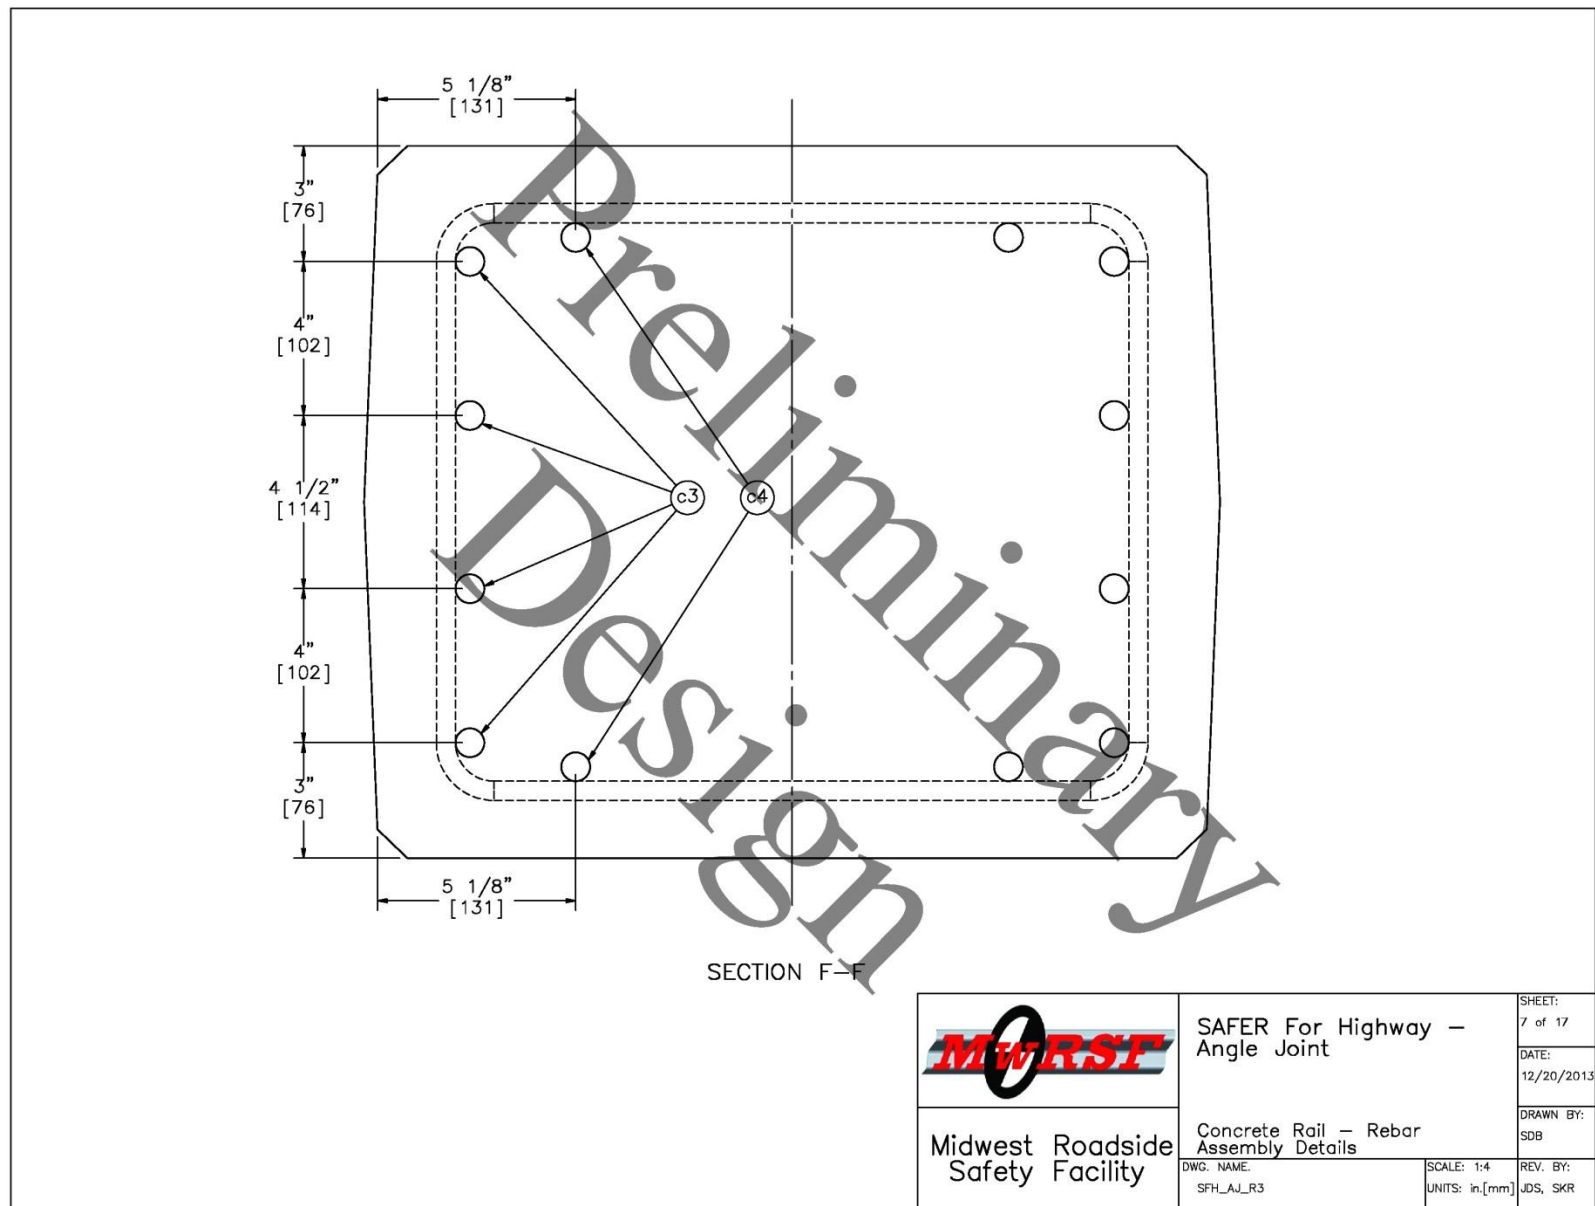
Preliminary Barrier Design, Rebar Assembly Details
